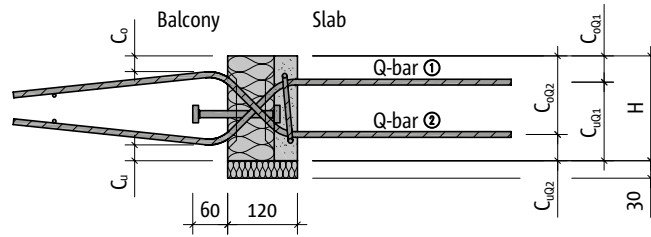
Section: Schöck Isokorb® type RQP10+RQP10
